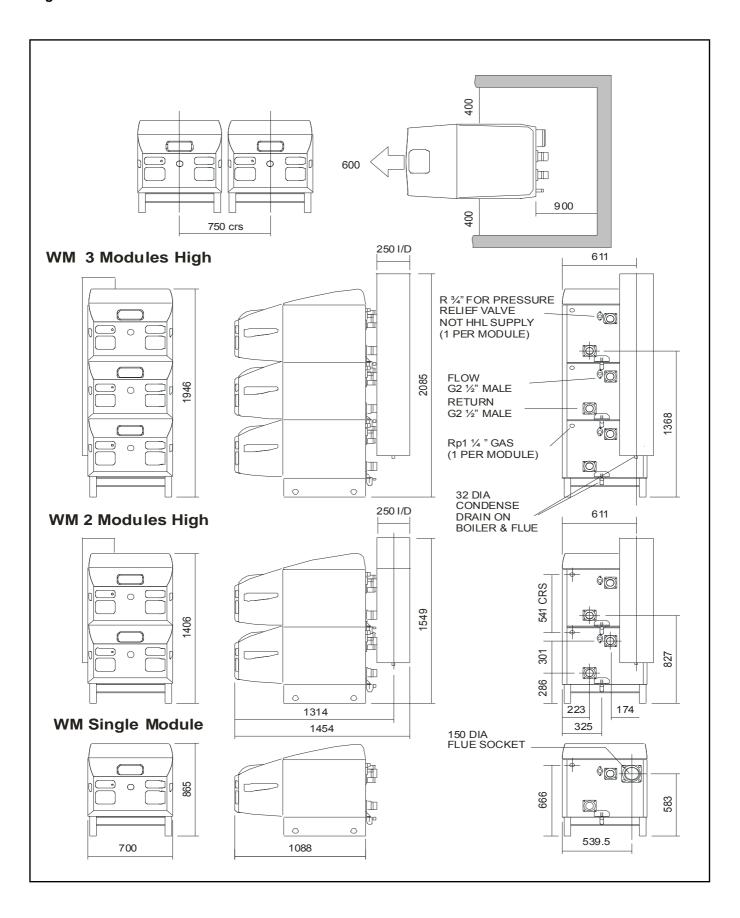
Dimensions and Clearances 150c/160he/200c/220he/250c
